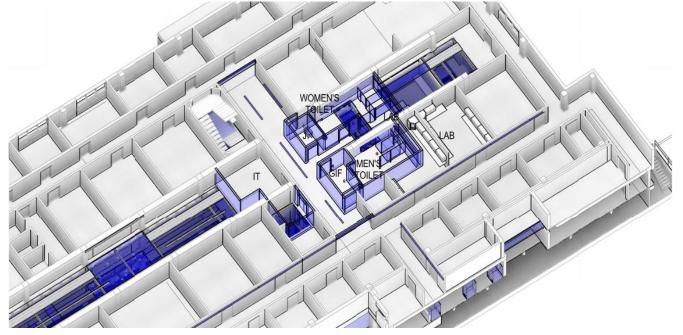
Phasing Diagram New Floor Plan, Level 3
